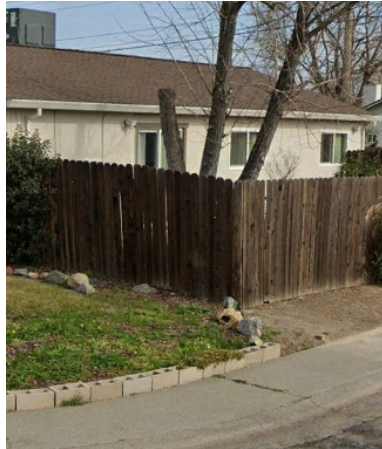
SUMP 158 NEAR GILLESPIE STREET
